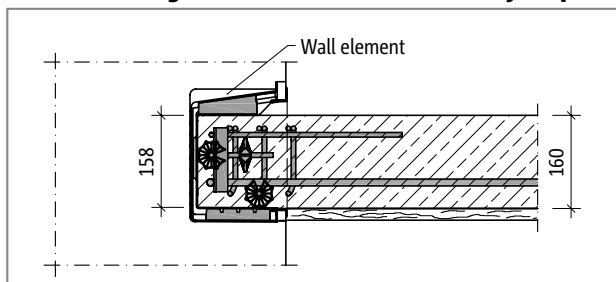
Schöck Tronsole® type Z: Wall element as stay-in-place formwork
